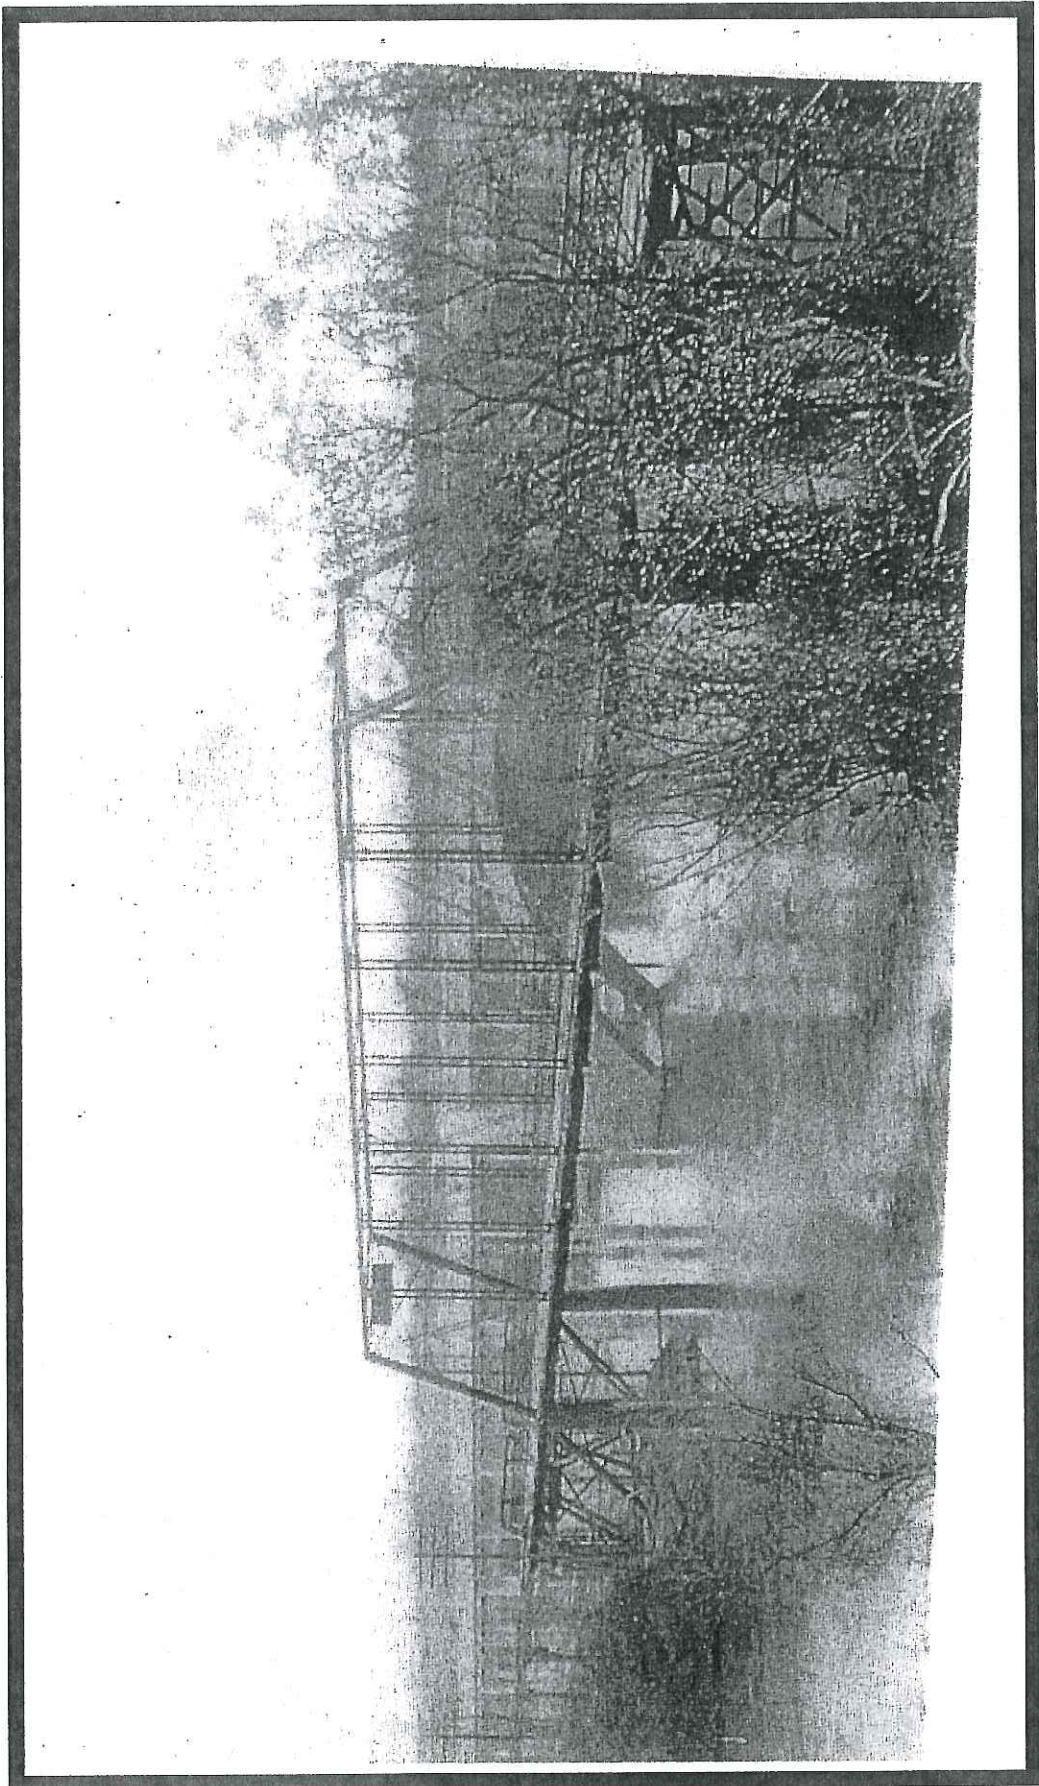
Railroad bridge and Woodrow Wilson Bridge; view from northwest.
